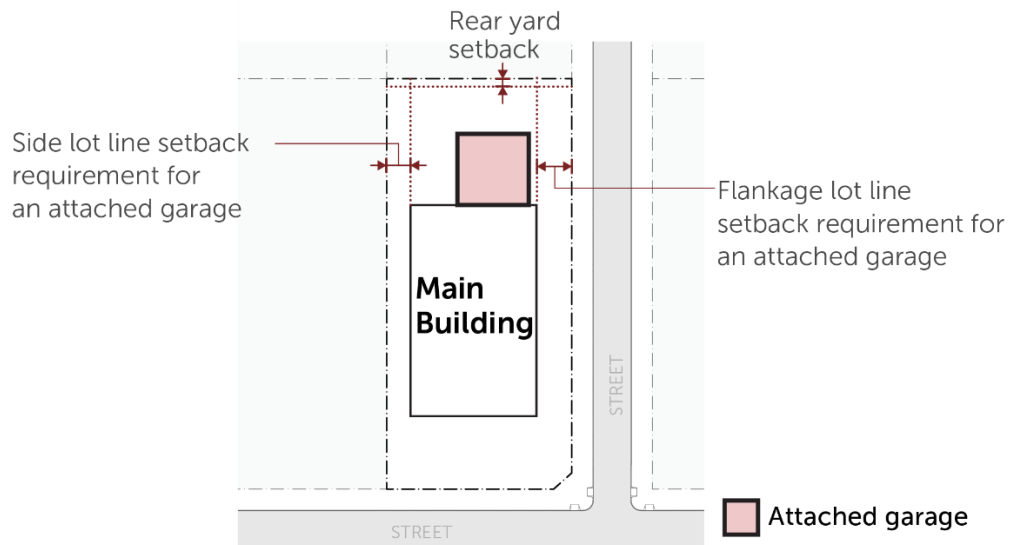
Section 3.13 – Provision for Garages Located in the Rear Yard
